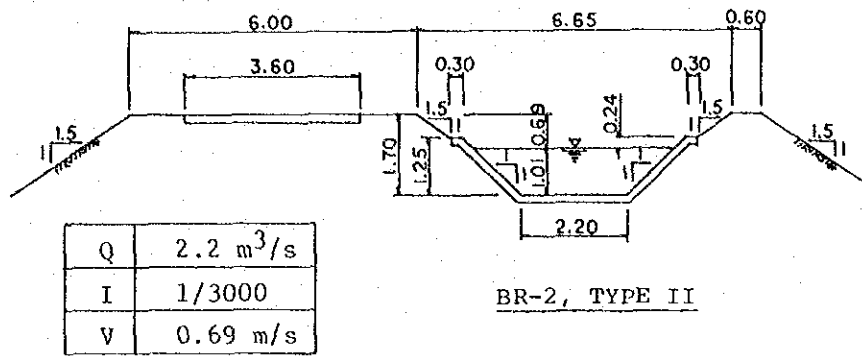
TYPICAL SECTIONS OF MAIN & BRANCH CANALS
